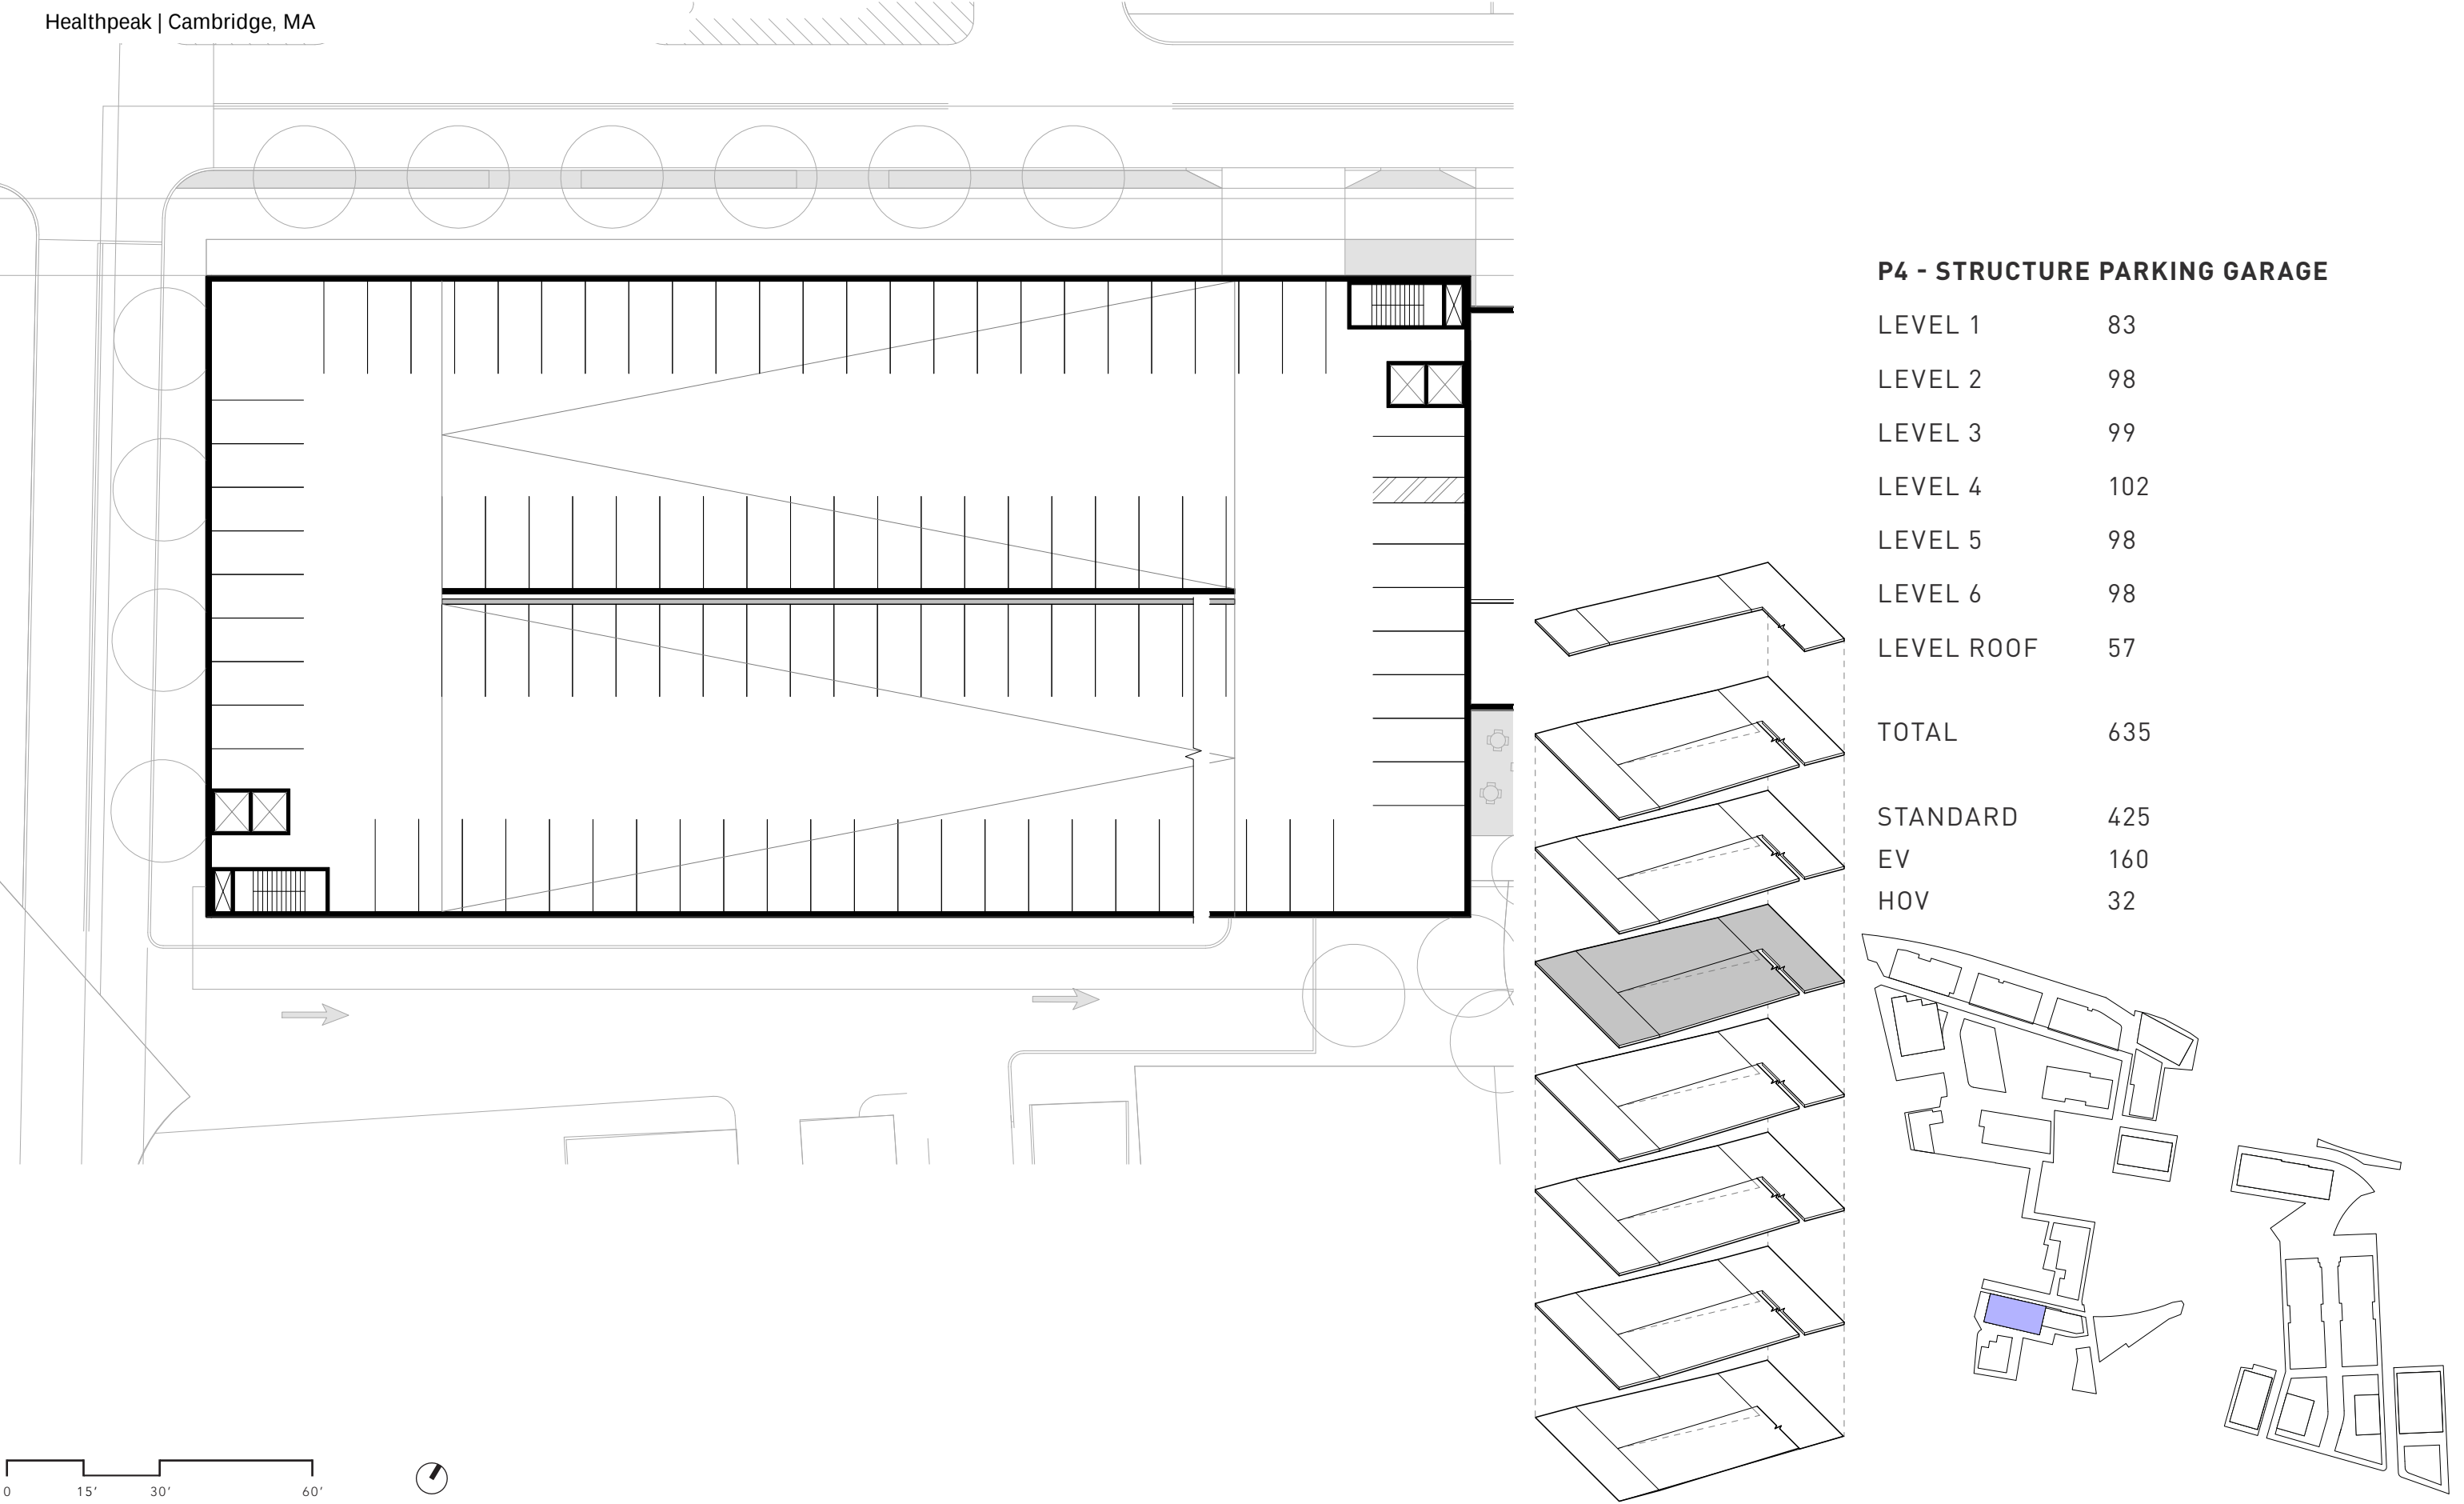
Proposed Vehicle Parking Plans - P4 Level 6
